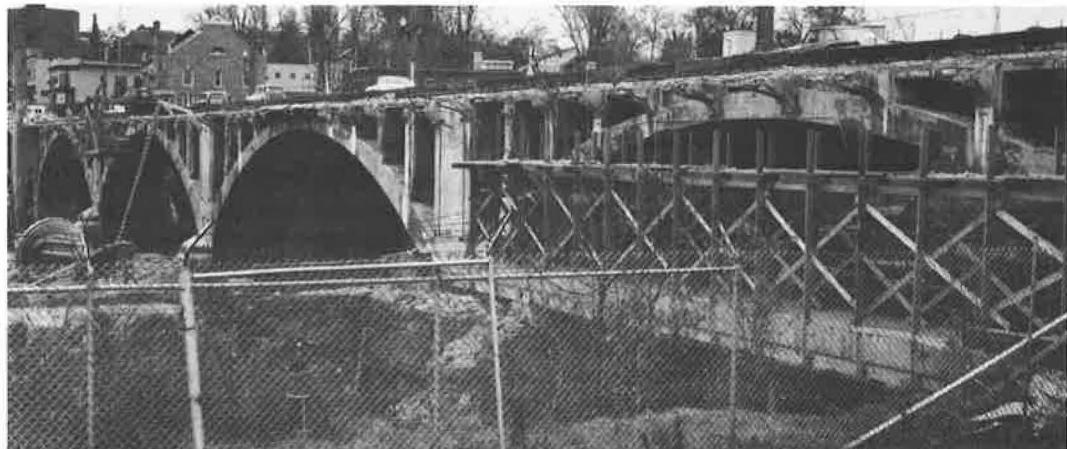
Glens Falls Bridge concrete arches after railings and wearing surfaces have been removed preparatory to repair and widening.
